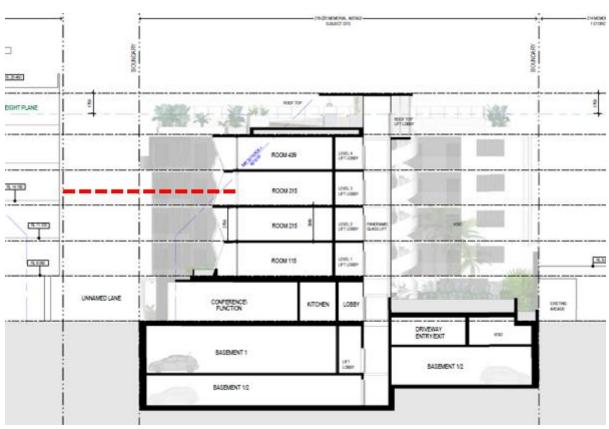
Proposed section showing distance achieved between proposed hotel rooms and the existing Atlantis development (15m) (dashed in red)
